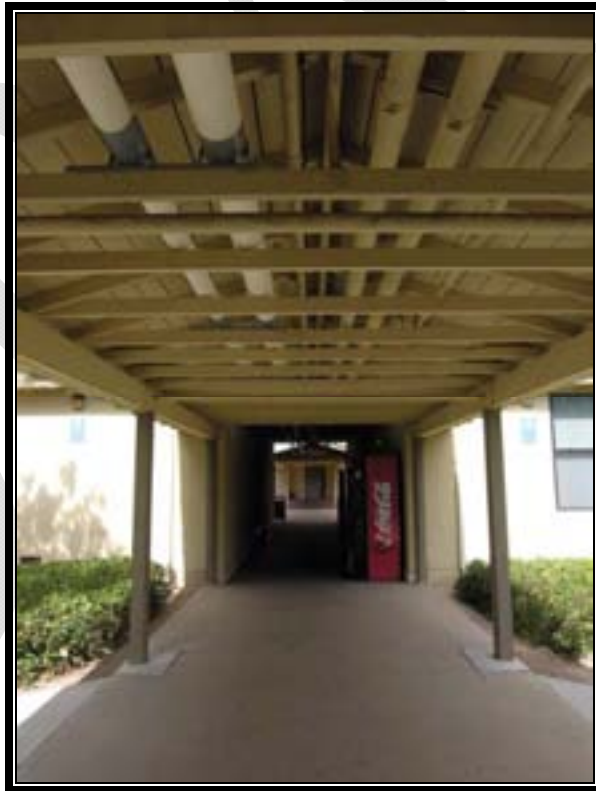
Building 864, detail of breezeway (Photo by RCGA, Inc., 2007)
